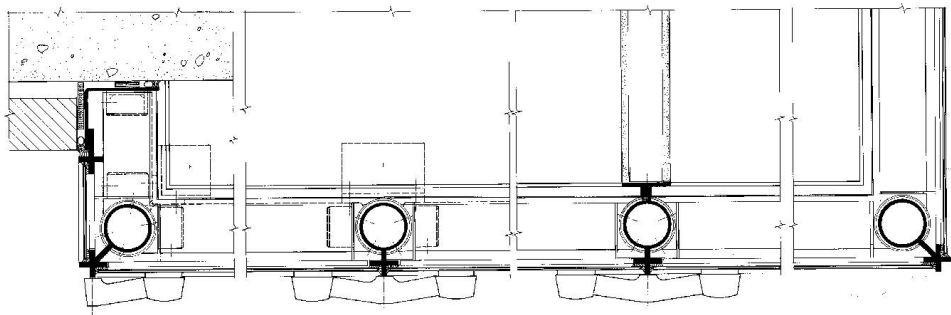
Horizontal section through curtain wall system. Image courtesy of SmithGroup.
